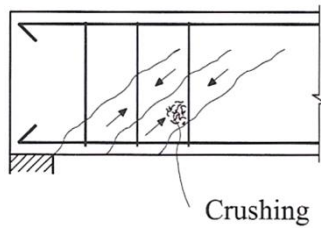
Web shear compression failure in a reinforced concrete beam.
